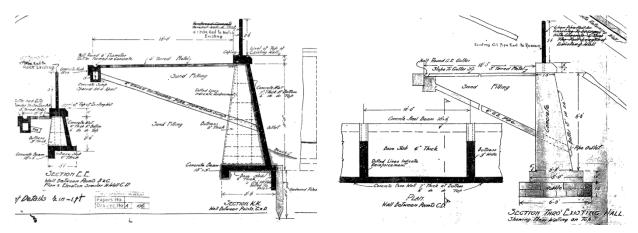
Extracts of undated but c1913 or 1914 drawing. Source: WLS Engineers drawing 263
